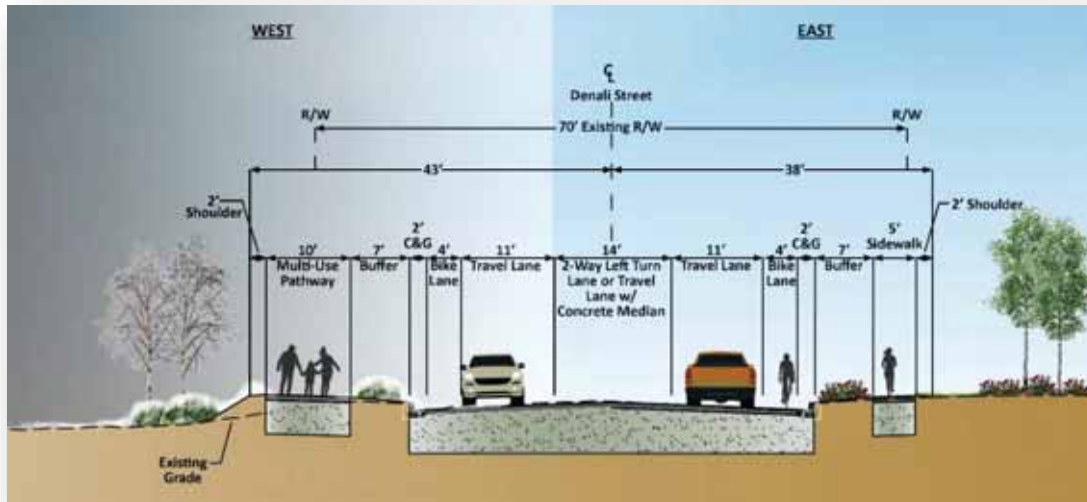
Denali Street (Tudor Road to 36th Avenue) – Alternative 2
